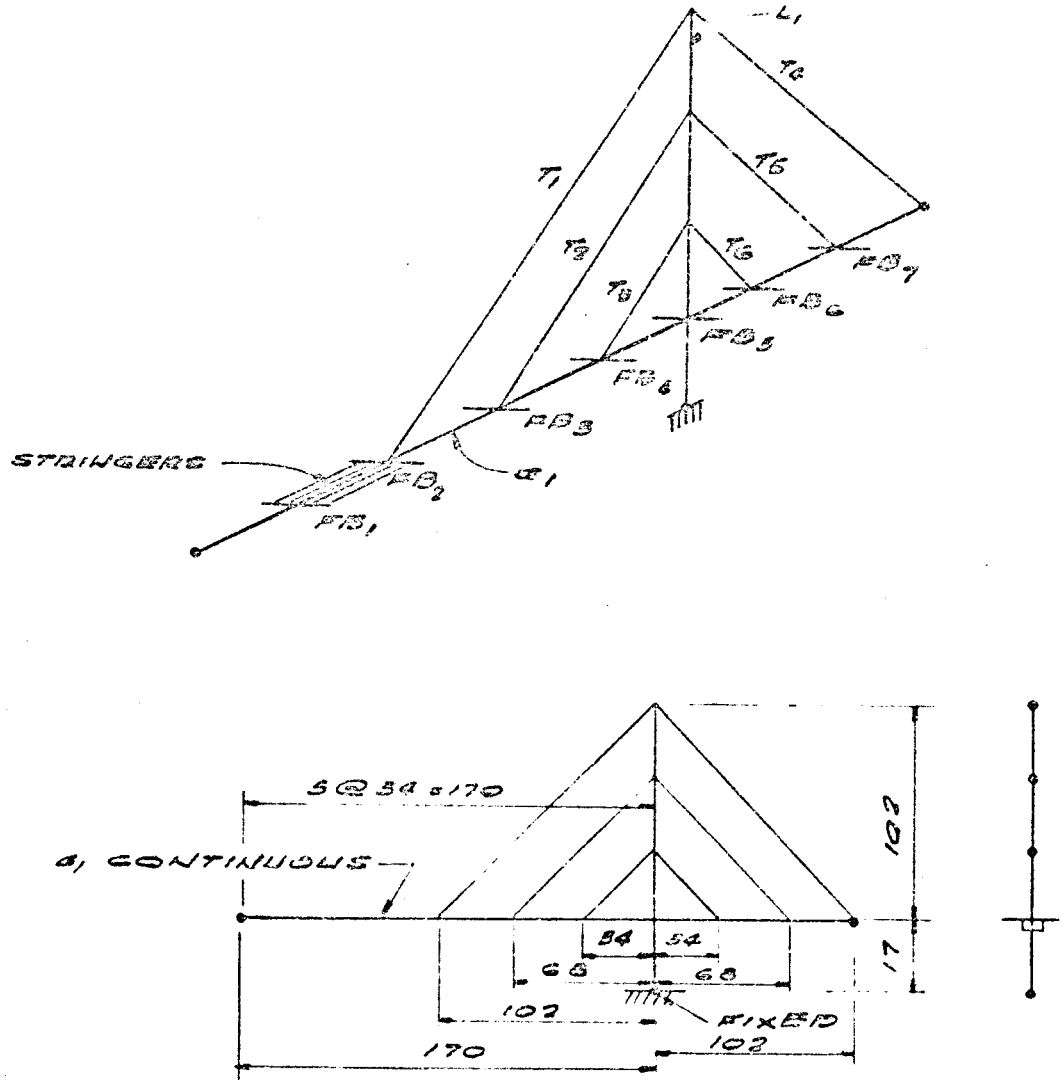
BRIDGE CONCEPT NO. 5. STAYED GIRDER
